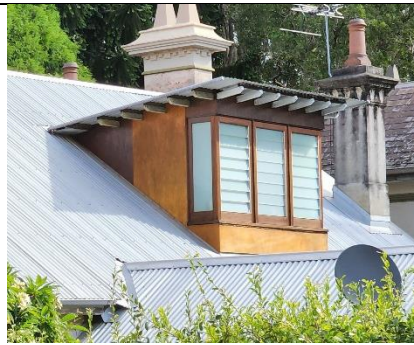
A contemporary design solution to adding a rear dormer on an historic house at 175 Bridge Rd Glebe. Its fine-grained detail and shadow are more sympathetic to the character of the house than the box on roof scheme proposed for number 45 and approved for number 47.
